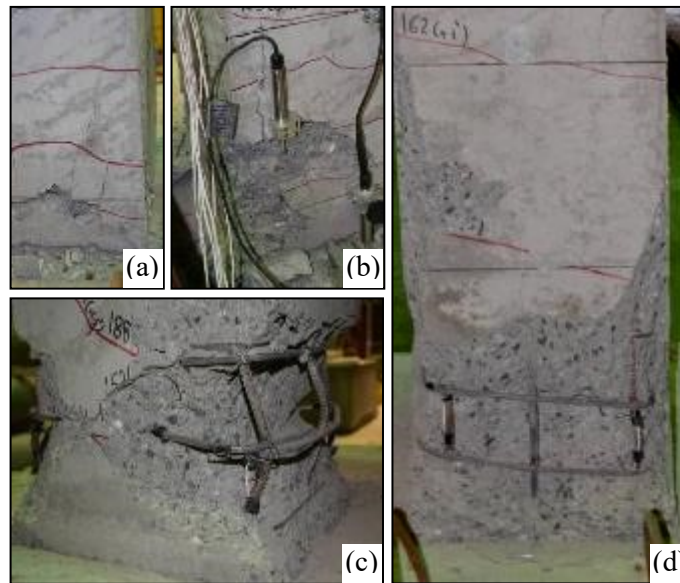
Typical failure progression of the steel-reinforced columns: (a) vertical splitting; (b) spalling of concrete cover; (c) buckling of longitudinal bars; and (d) concrete crushing causing failure.
